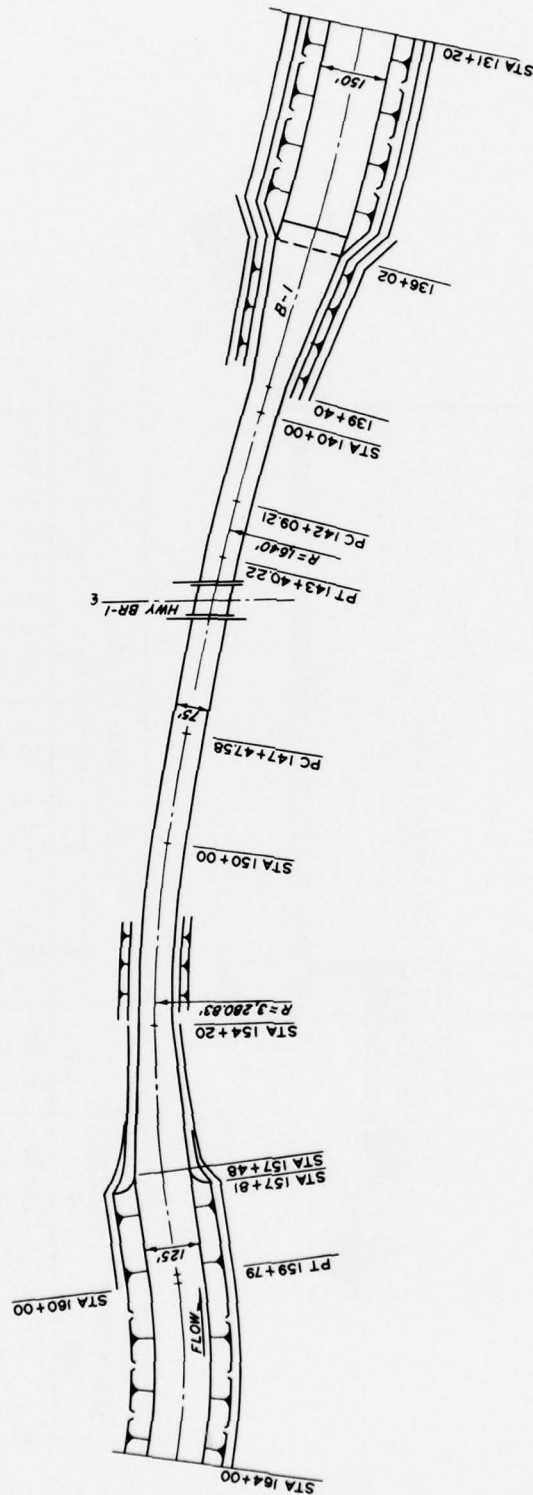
Original riprap plan upstream of the Bucana transition design 3 at sta 157+81
